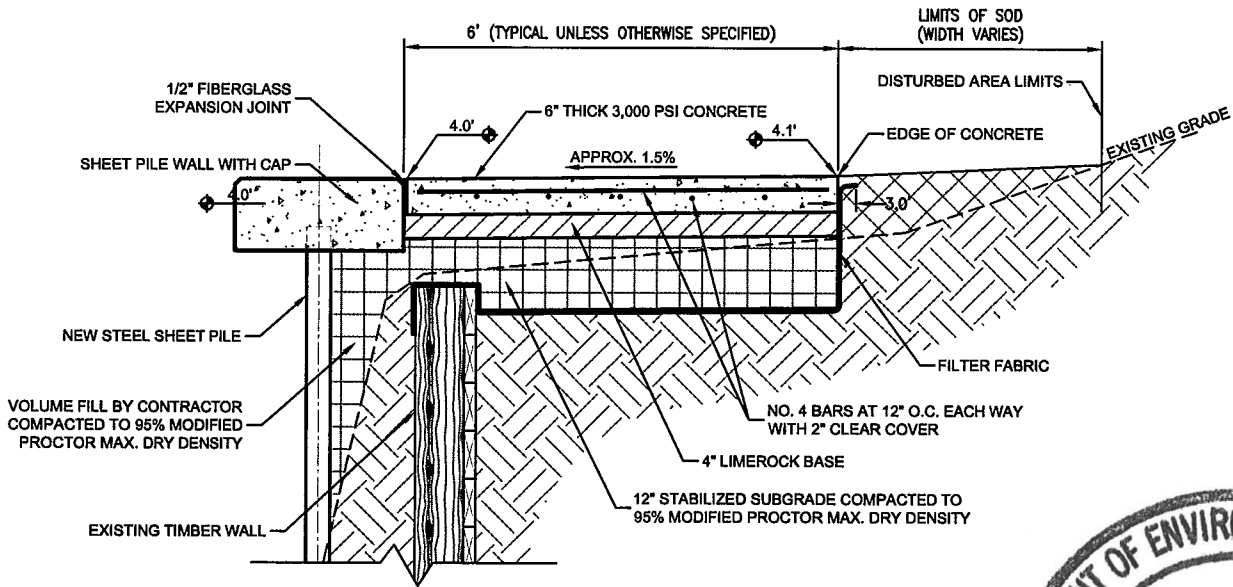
SHEET PILE (ASTM A572 GR 50)
